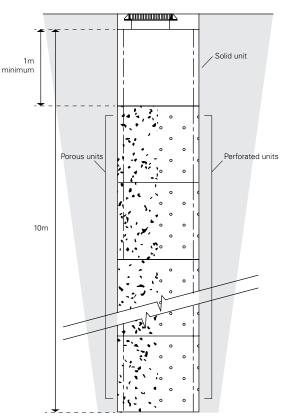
Typical No Fine or Precast Concrete Perforated Layout
